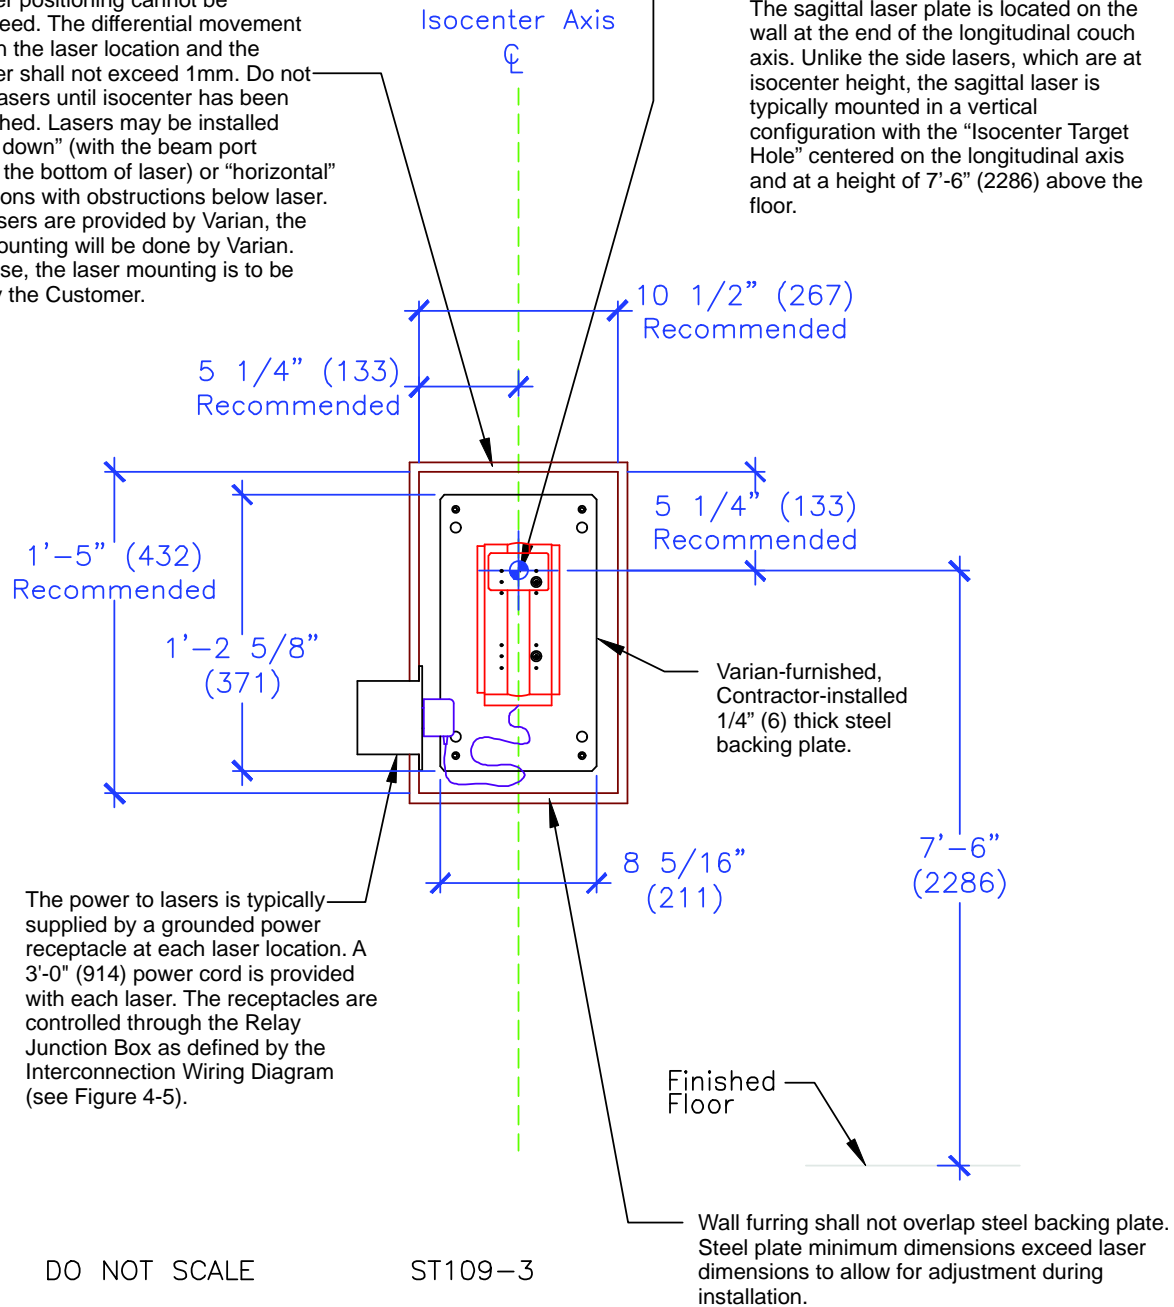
Sagittal Laser Mounting Details (Recessed in Wall) – Elevation View
